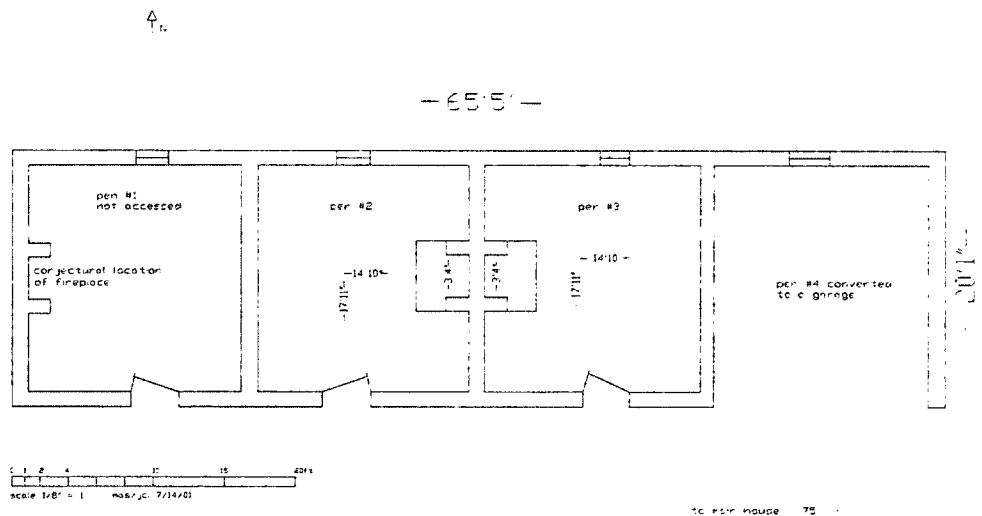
Planview of the John Fain slave house, Dandridge, Jefferson County.
